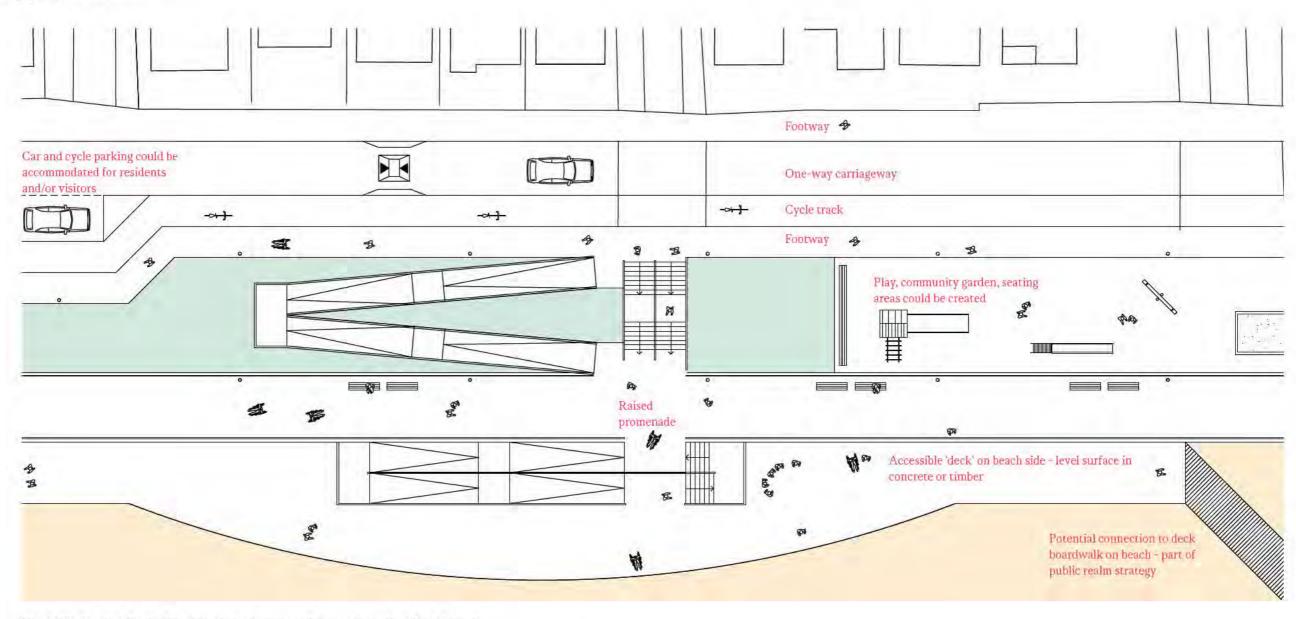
Option B - indicative plan of proposed new sea wall at Brooklands.
